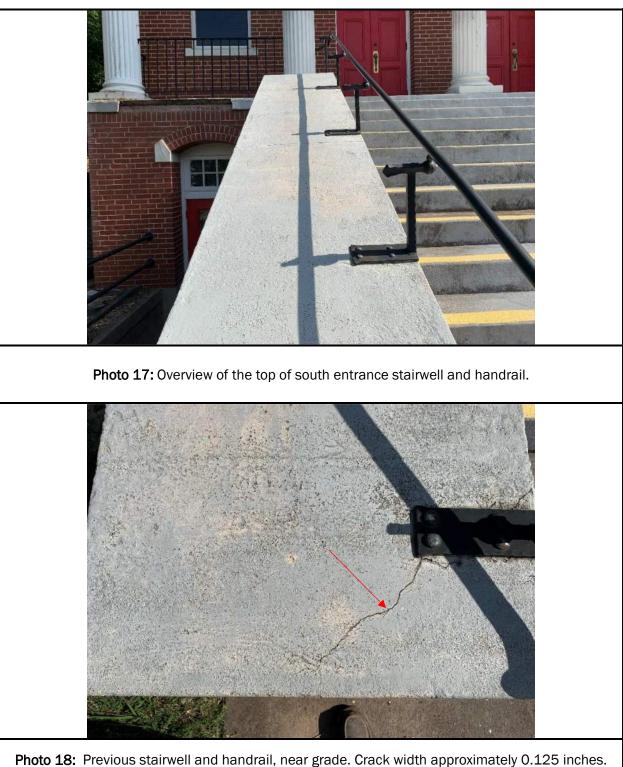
Previous stairwell and handrail, near grade. Crack width approximately 0.125 inches. Clean and apply elastomeric coating should be considered.
